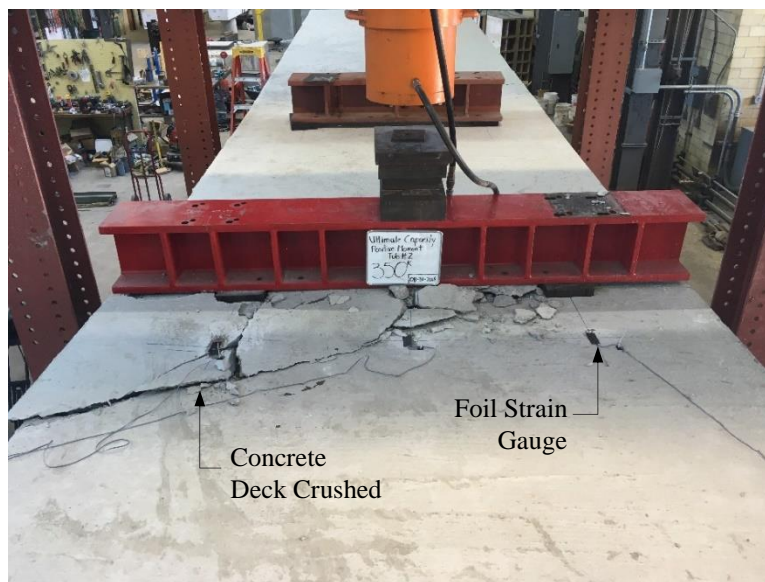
Concrete Deck Crushed at Loading Point – Tub #2
